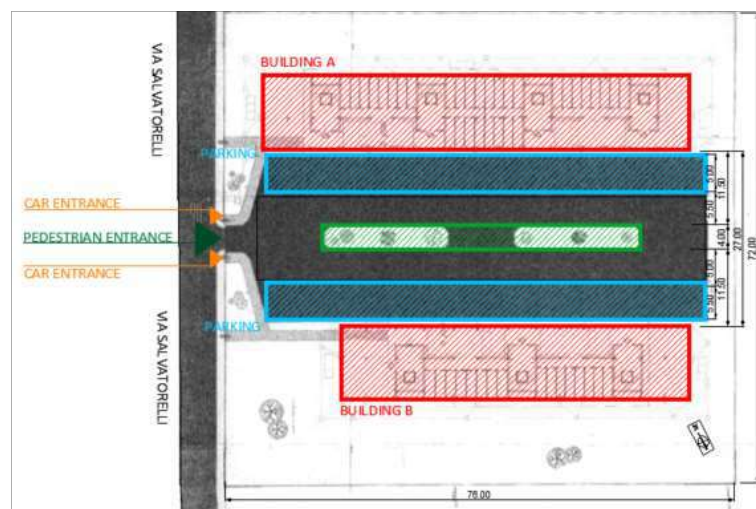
COMPLEX A-General Plan on which the building site organization is highlighted (buildings A and B, the parking area, the green area, the driveway and the walkway).
